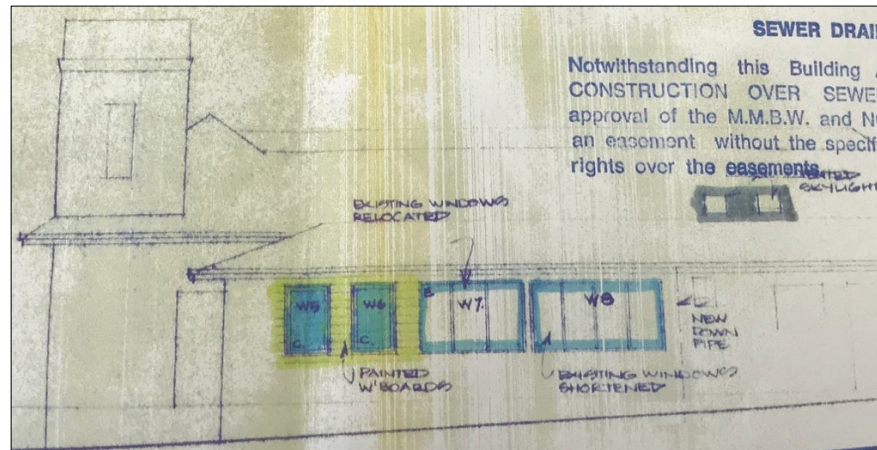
Part of the 1984 building plans showing alterations to the east elevation involving alterations to windows. Source: Banyule City Council.
